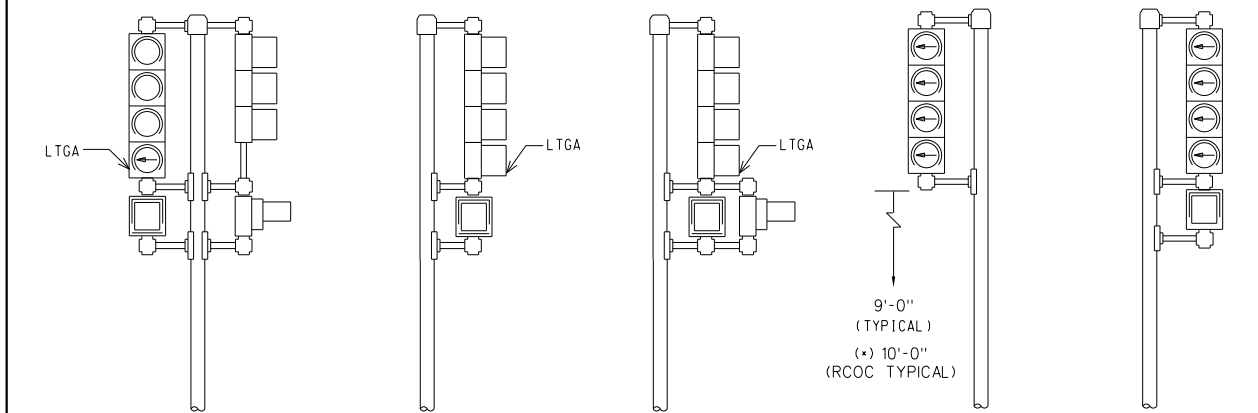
"      DETAIL "G-2"      DETAIL "H-2"      DETAIL "I-2"      DETAIL "J-2"
